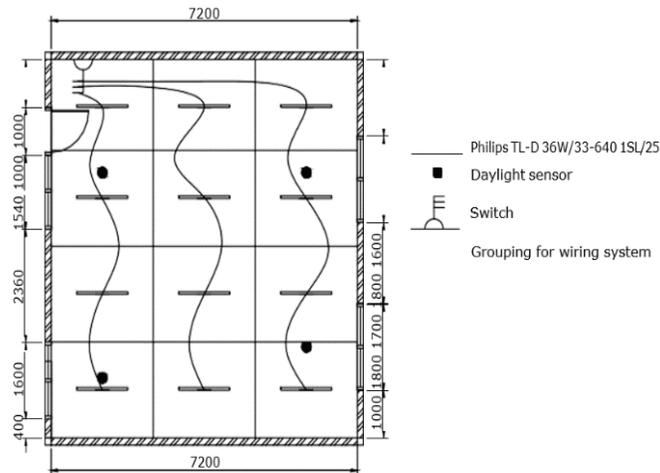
Sensor and lighting plan for Santa Maria Senior High School
